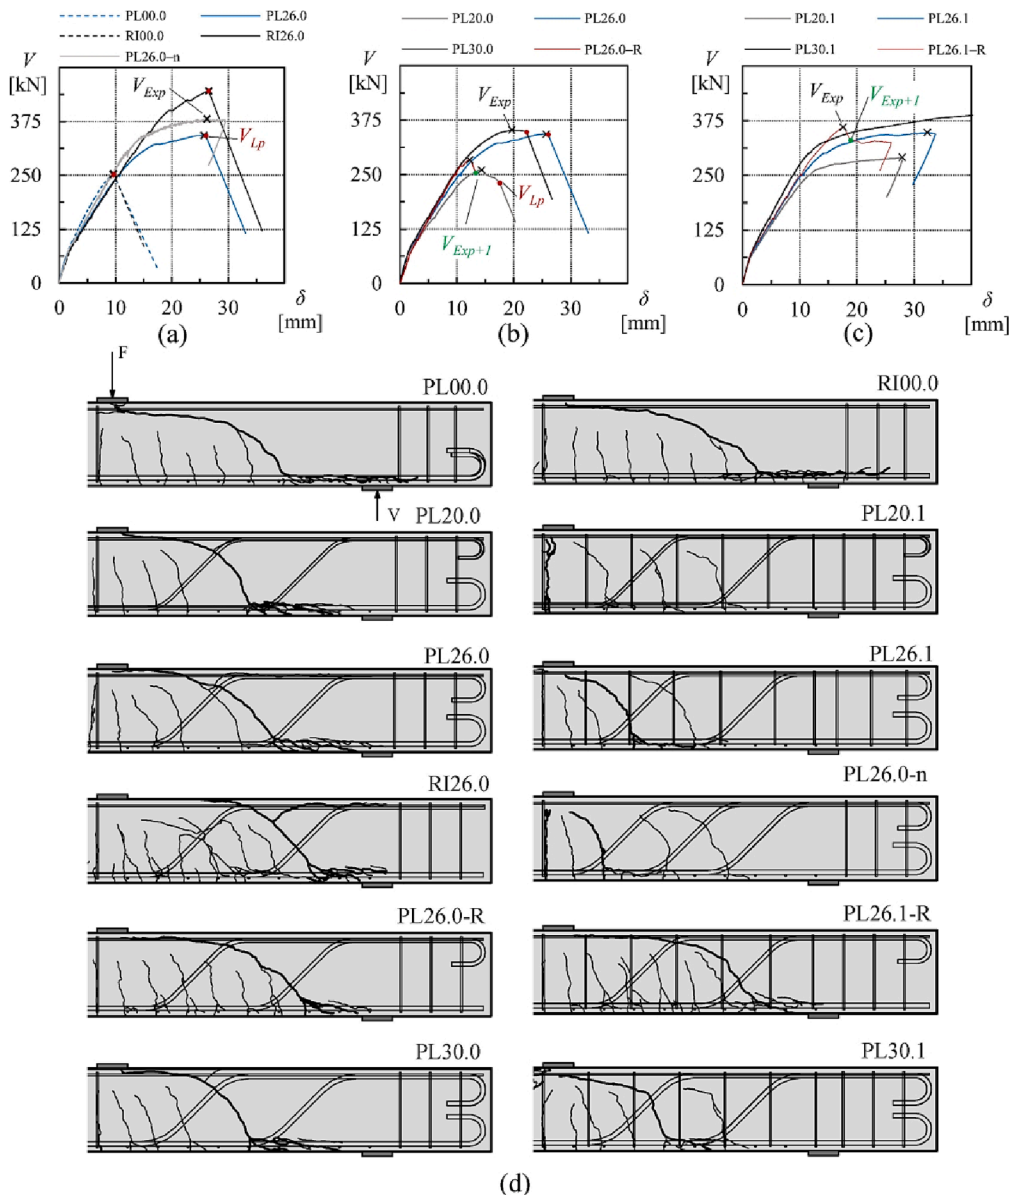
Shear force vs relative deflection for: (a) beams with ribbed and plain reinforcement; (b) beams with plain bent-up bars; (c) beams with additional stirrups; (d) post-failure crack pattern for all specimens.
